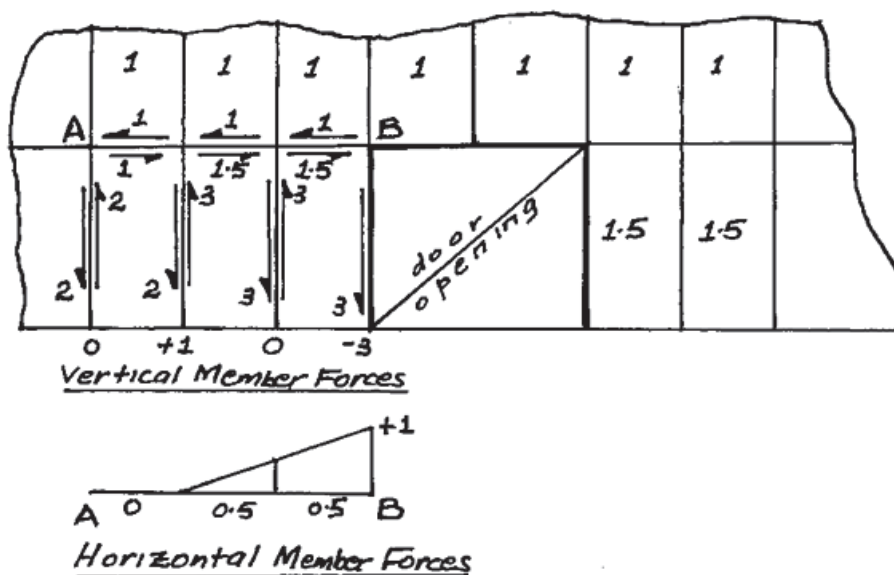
Shows panel shear flows and resulting nail force accumulation
